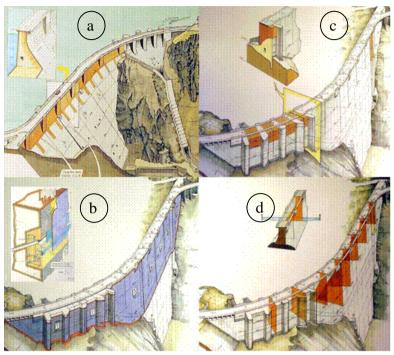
1990's main works in relation with AAR a: crack grouting, b: upstream sealing, c: old spillway concrete, d: slot cuts
